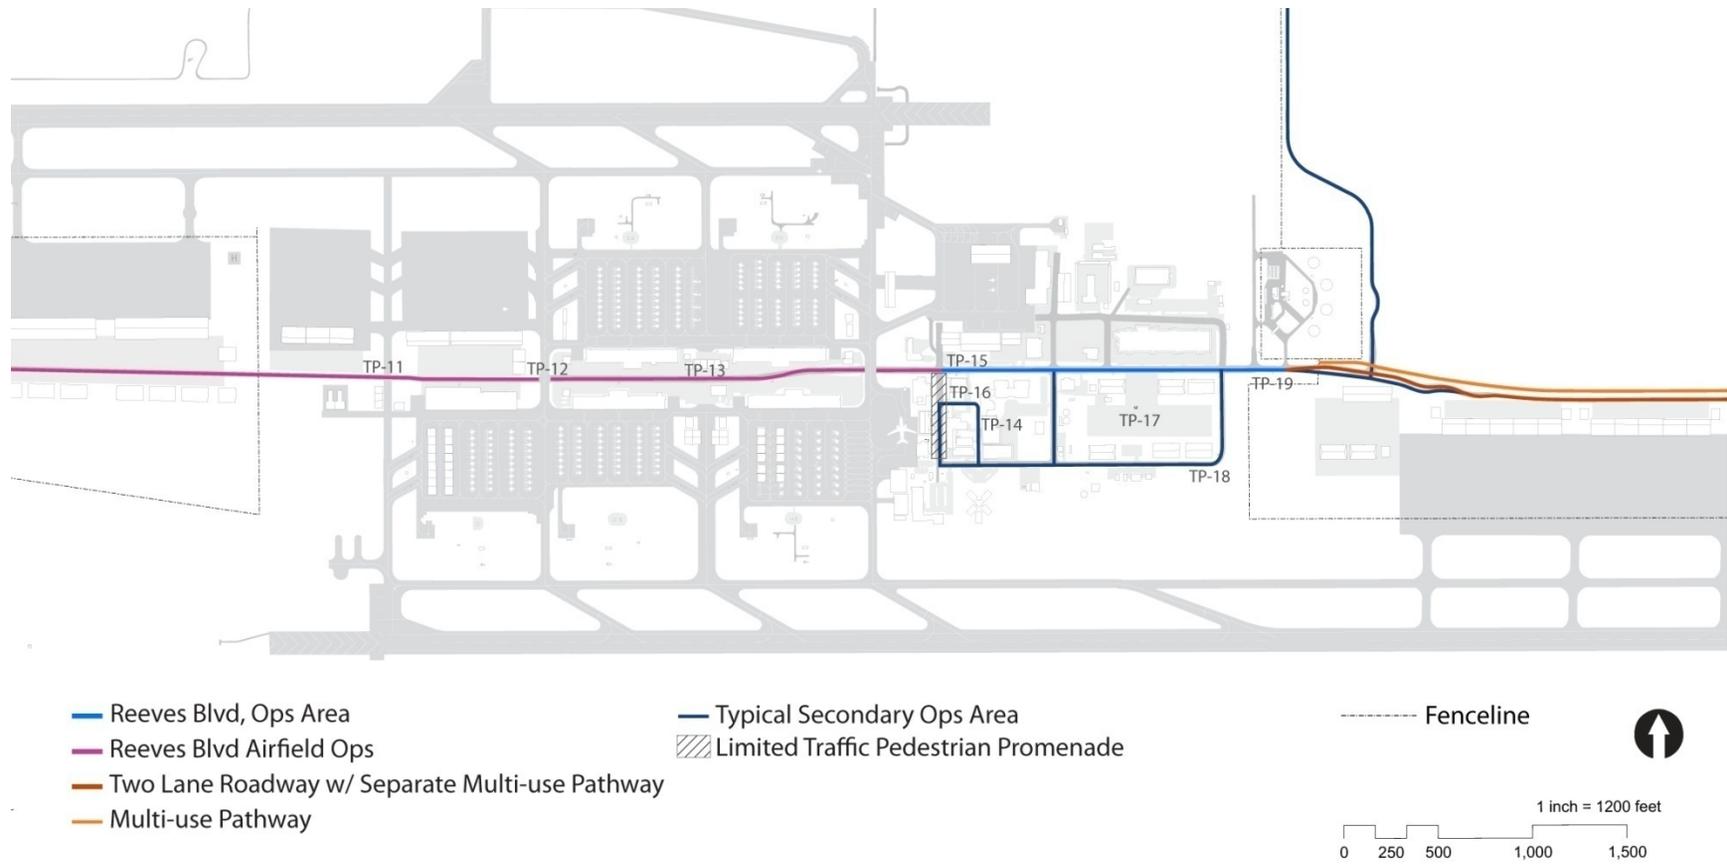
INSTALLATION STREET AND TRANSIT PLAN (OPS SIDE)
